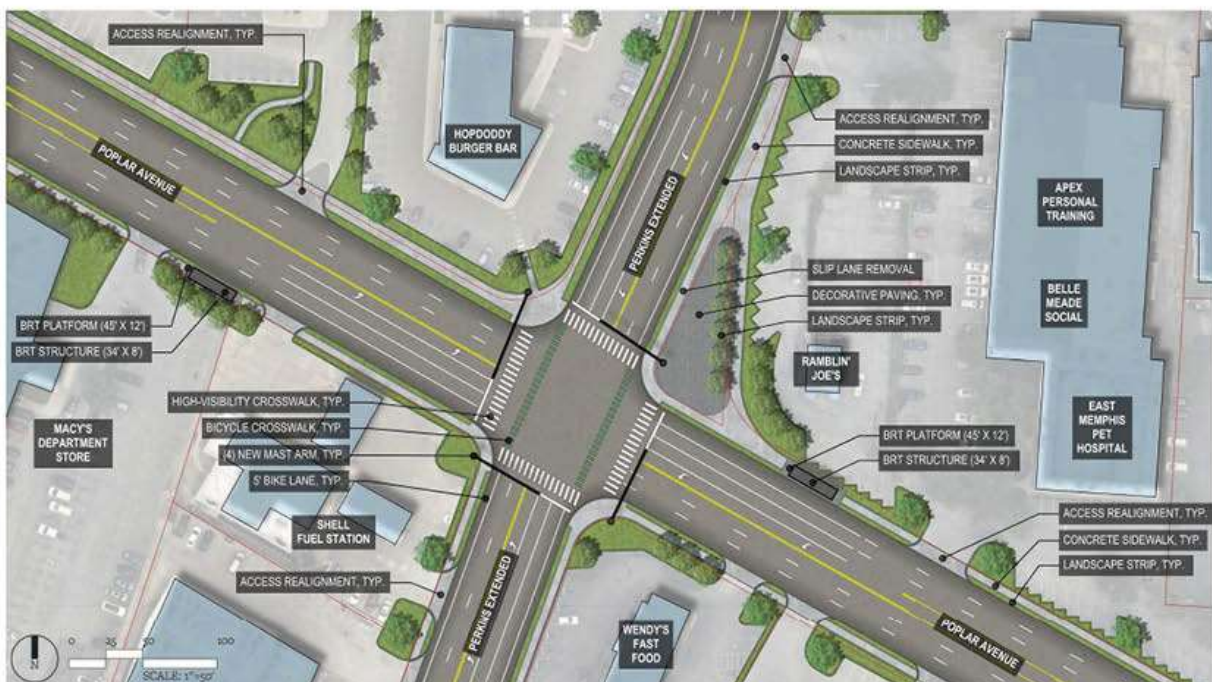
Poplar Avenue at Perkins Extended Existing Aerial and Concept Plan
